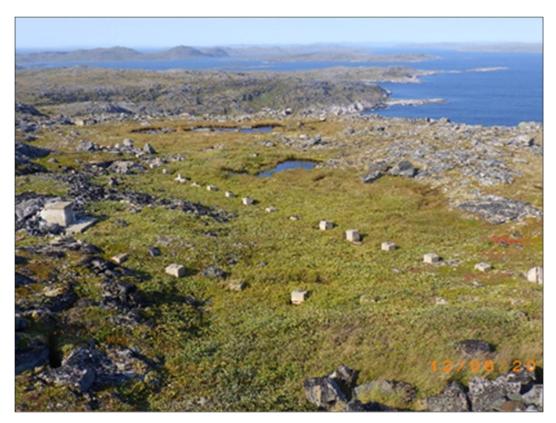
APEC #10: Former concrete curbing for the radiomen to the west of the main building. (September, 2017)
